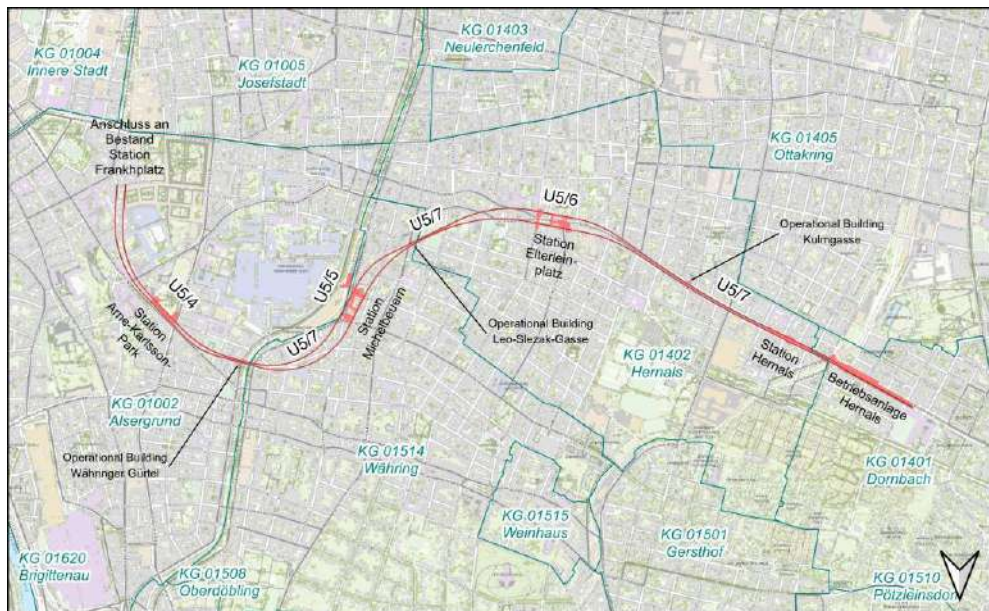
Overall Site Plan U5 second section (Source: IGT Geotechnik und Tunnelbau).
